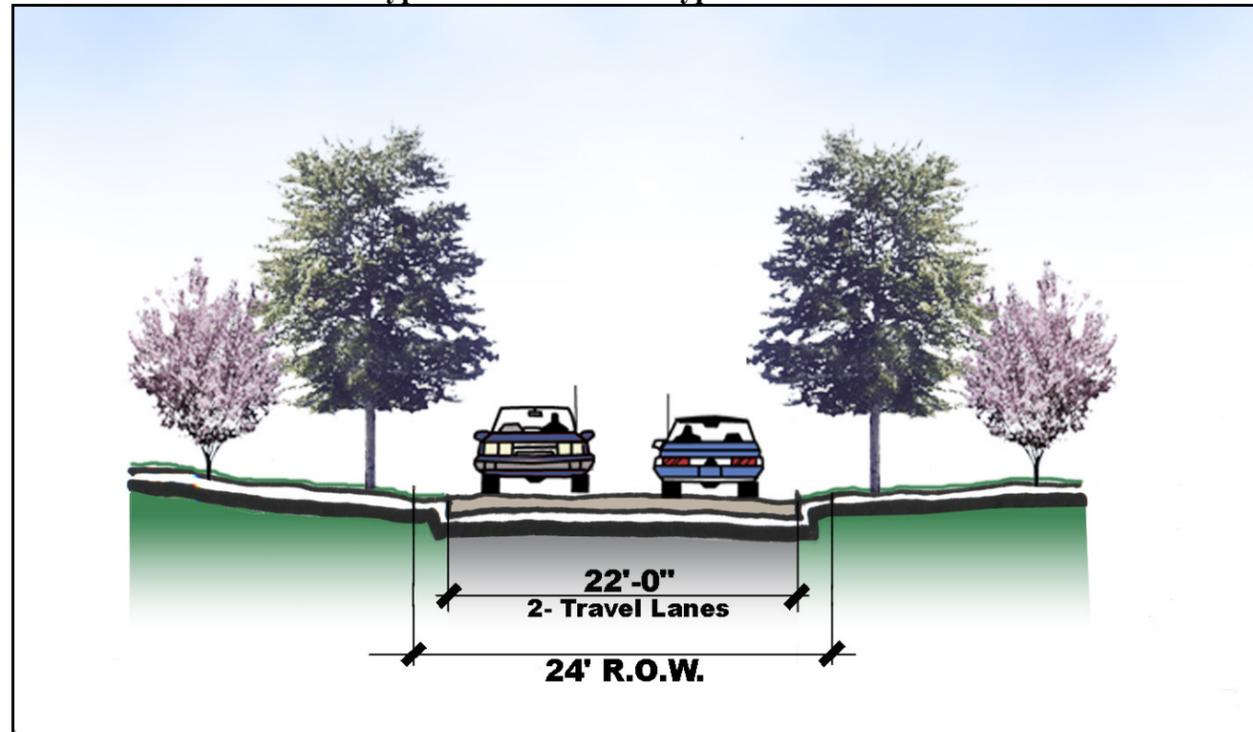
Typical Cross-Section: Type III Parallel Access Road
